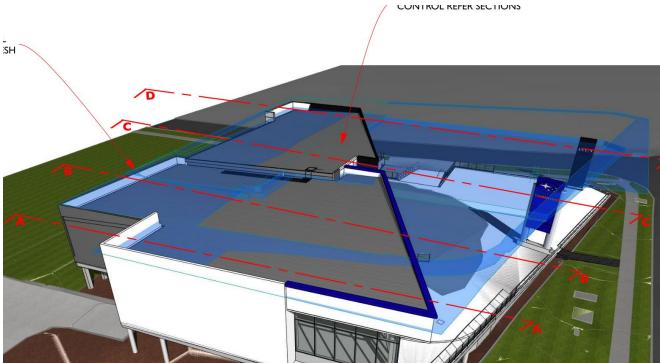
Building height plane looking in a south-eastern direction – the brown roof area shows areas where the building is above 9.5m and blue shows the 9.5m height control.
